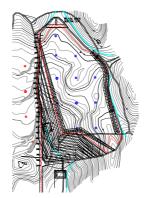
Installation Plan of Gas Removal Pipes in UCDS
